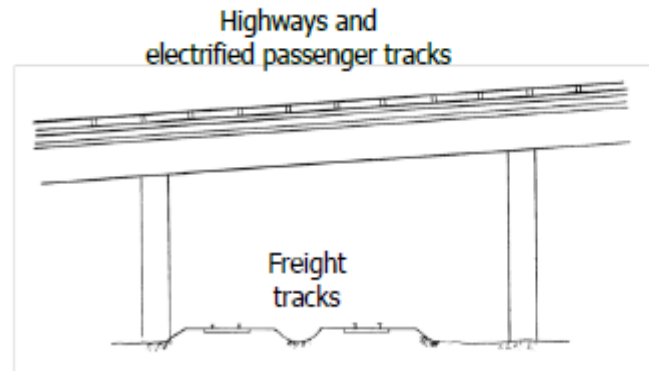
Bridge elevation view with two electrified passenger rail tracks carried on the bridge and two freight rail tracks below the bridge.
